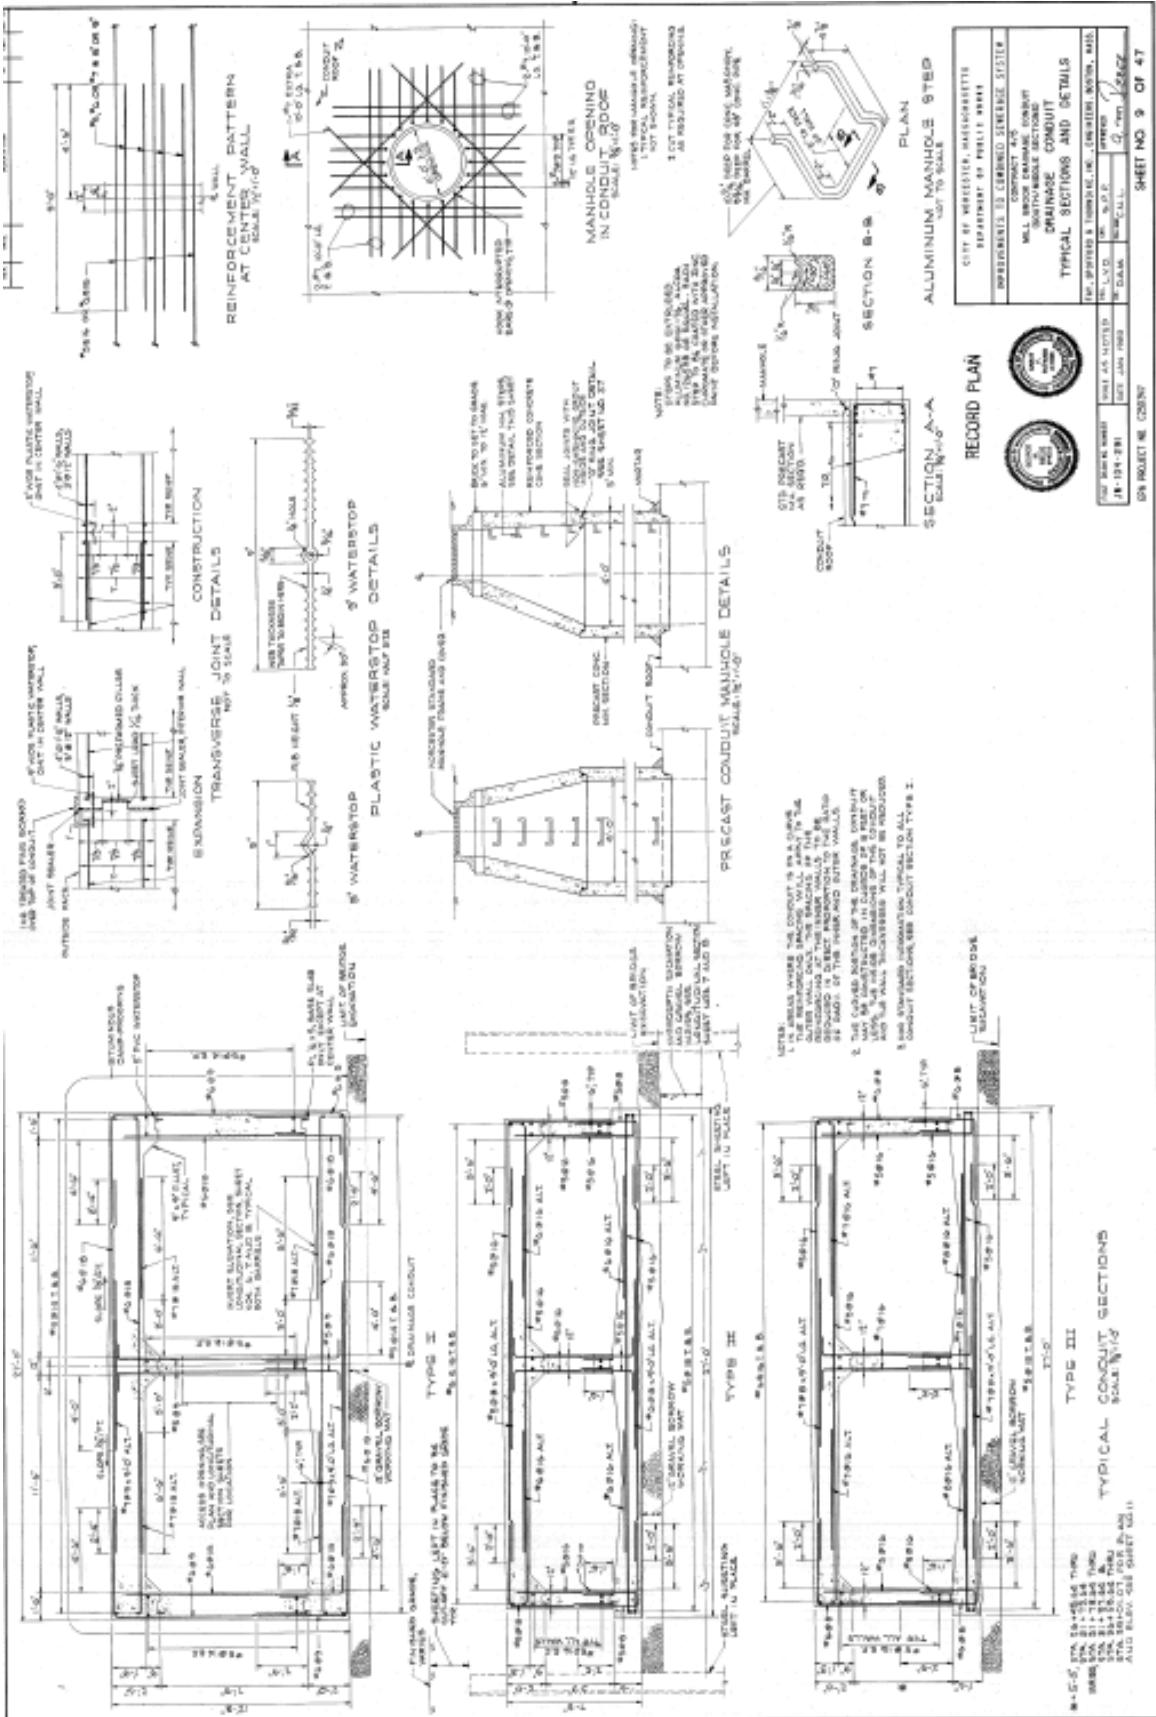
Improvements to Combined Sewerage System Contract No. 4-5 - Typical Sections and Details
